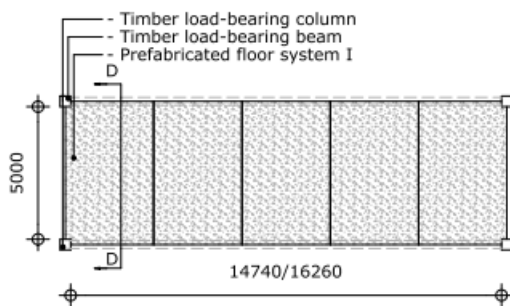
Top view floor design 4 prefab concrete floor in mm
